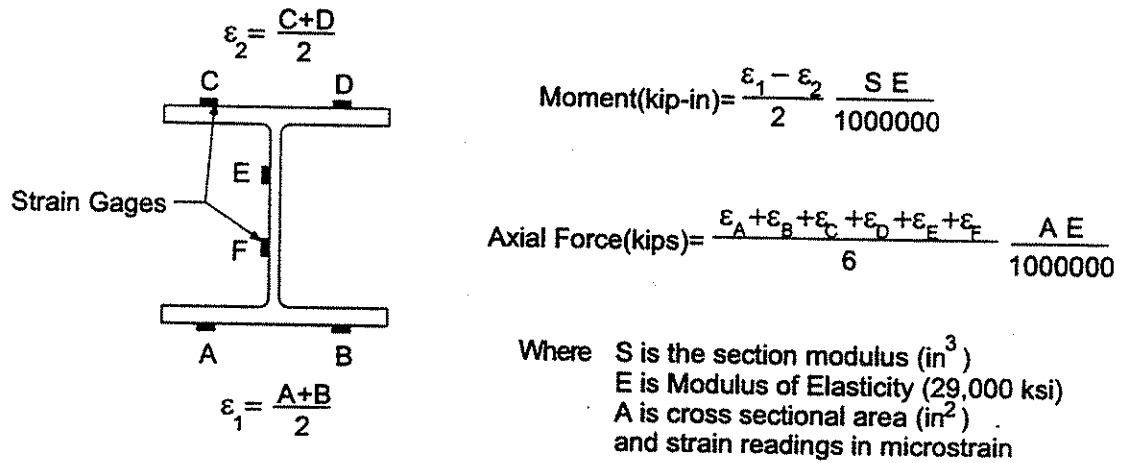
Strain gage layout at each of the two instrumented column cross sections.
